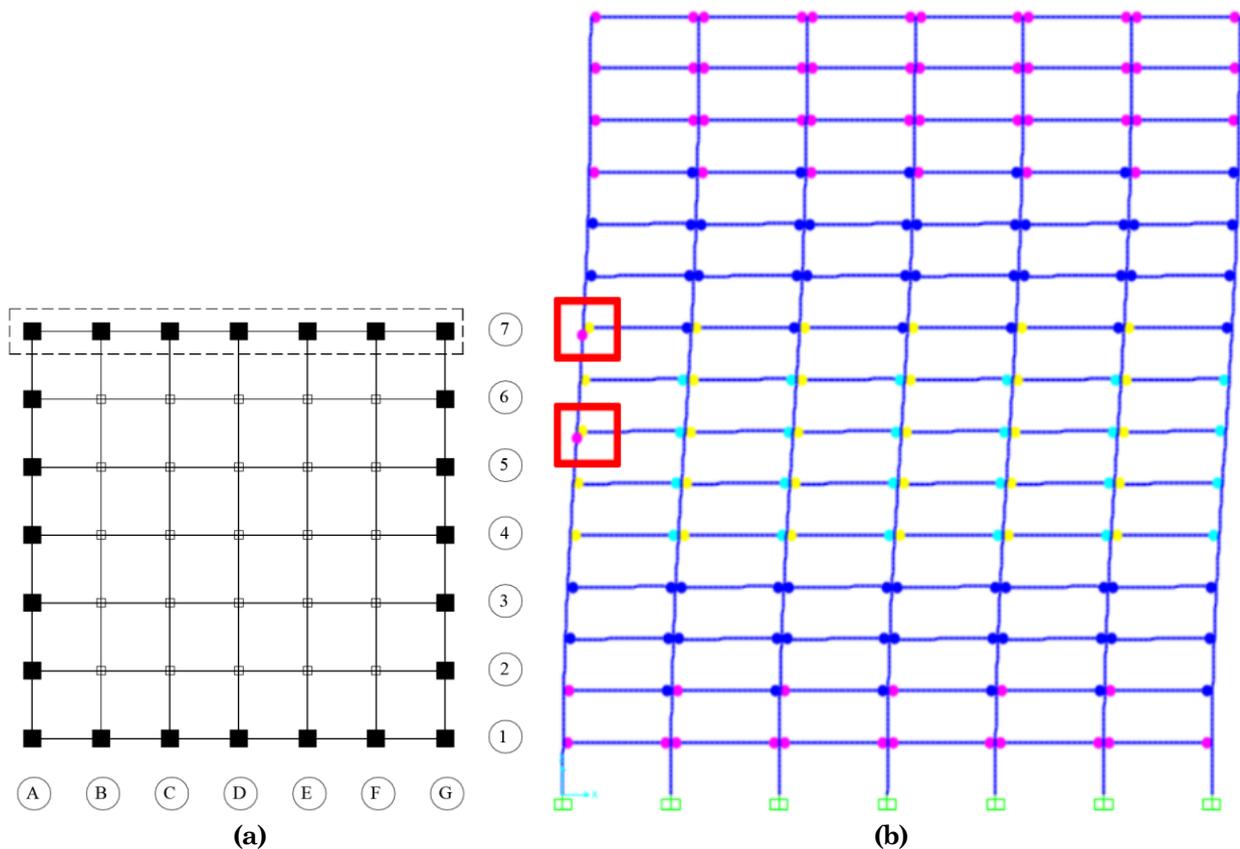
Plastic Damages of Building 6A-30% due to  $MCE_R$  at Frame 1: (a) Plan View; (b) Elevation View
